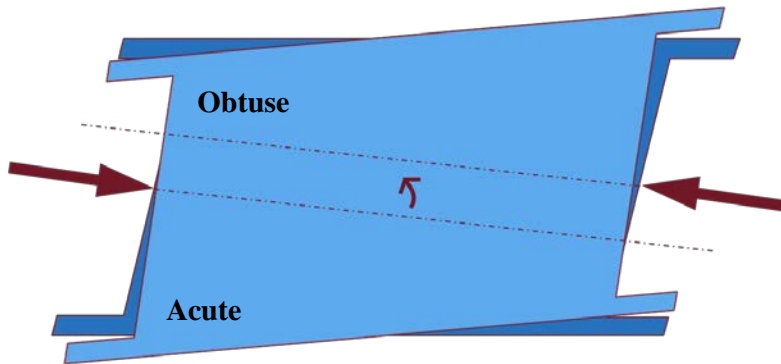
Schematic of Seasonal Rotation in Plan View of East Montpelier Bridge
